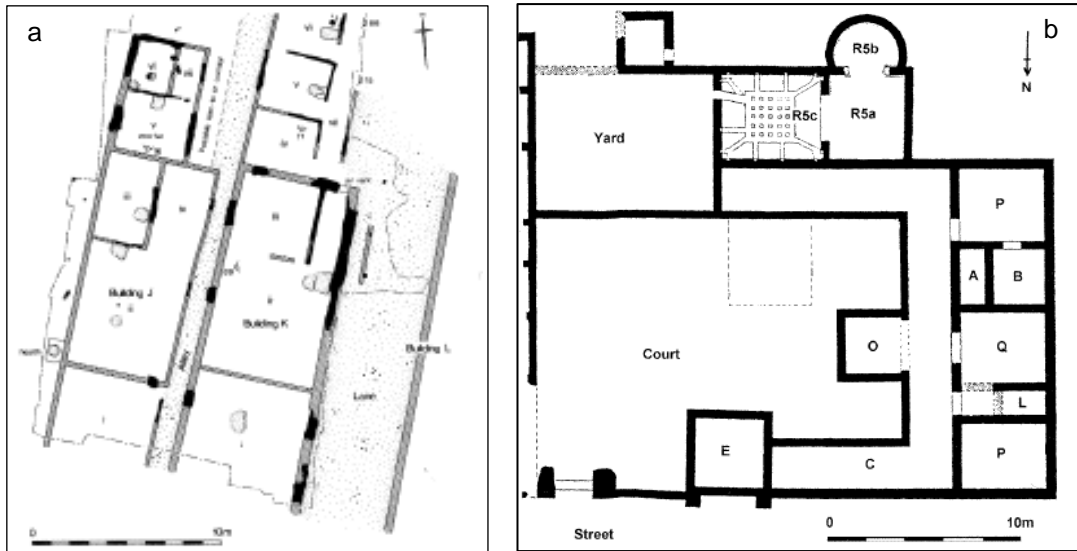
Examples of domestic architecture at public towns: (a) second century strip houses at Newgate Street, London (Perring 2002: 58, Fig. 12); (b) courtyard house at Silchester (Perring 2002: 49, Fig. 9).
